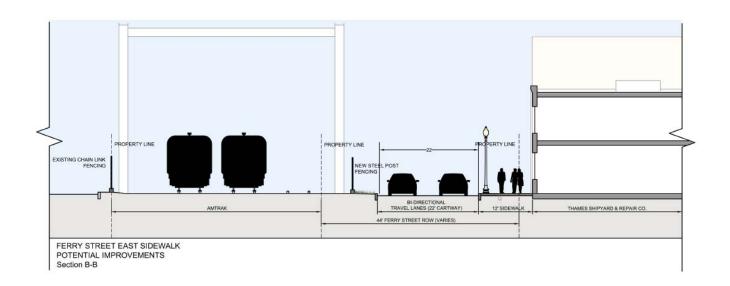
Specific Pedestrian Improvements – Section Views Along Ferry Street (Section B-B)
